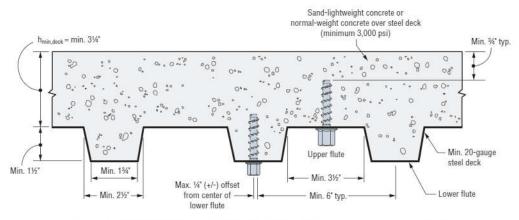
THDB25158RH and THDB37158RH Installation in Concrete over Metal Deck
